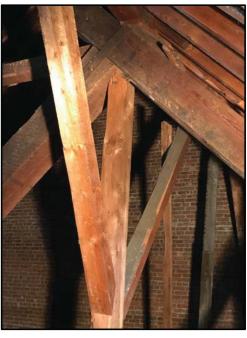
Post at Typical Truss is loose where it meets truss top chord and diagonal. Common at all Typical Trusses indicating deflection in trusses.
